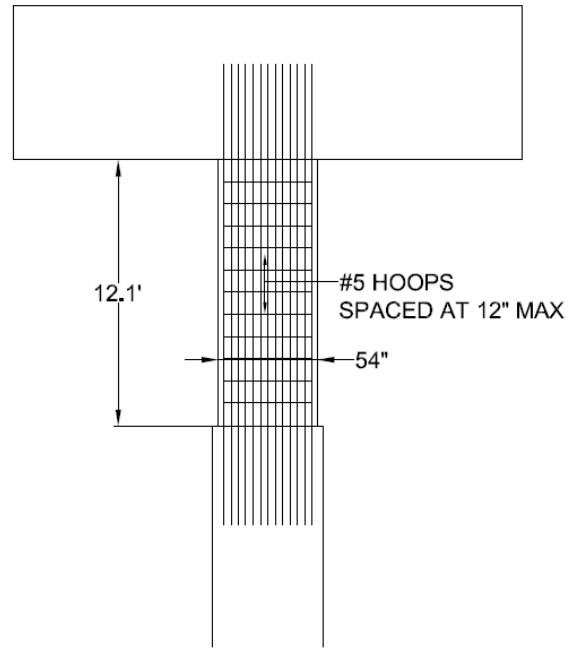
Little Bear Creek Bridge Bent 2 Final Design Details
